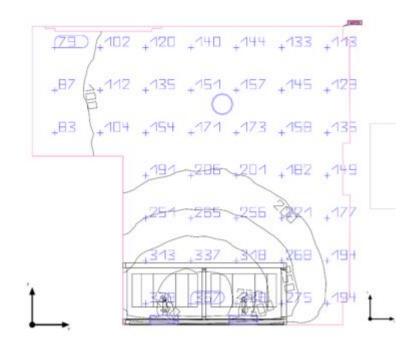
18:Light scene of lux values for artificial lighting in bathroom with plan of luminaires
